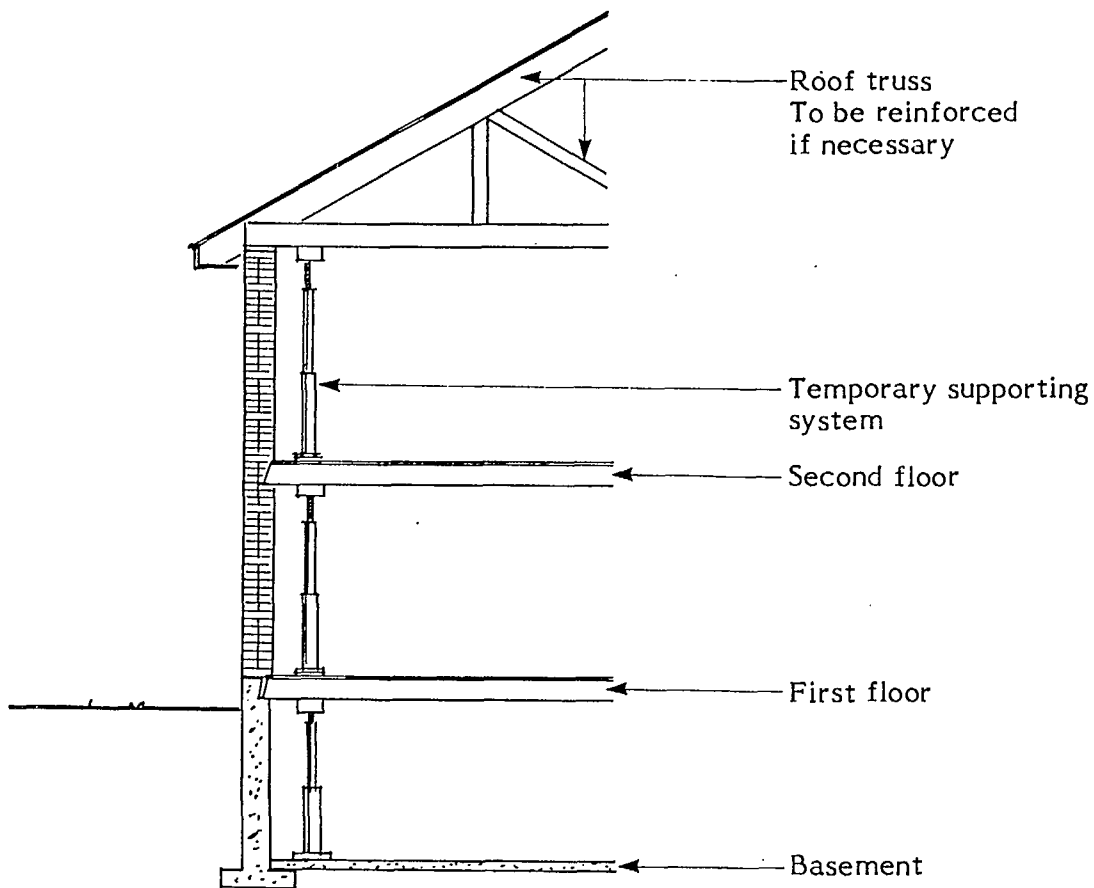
TEMPORARY SUPPORT FOR WALL REMOVAL
